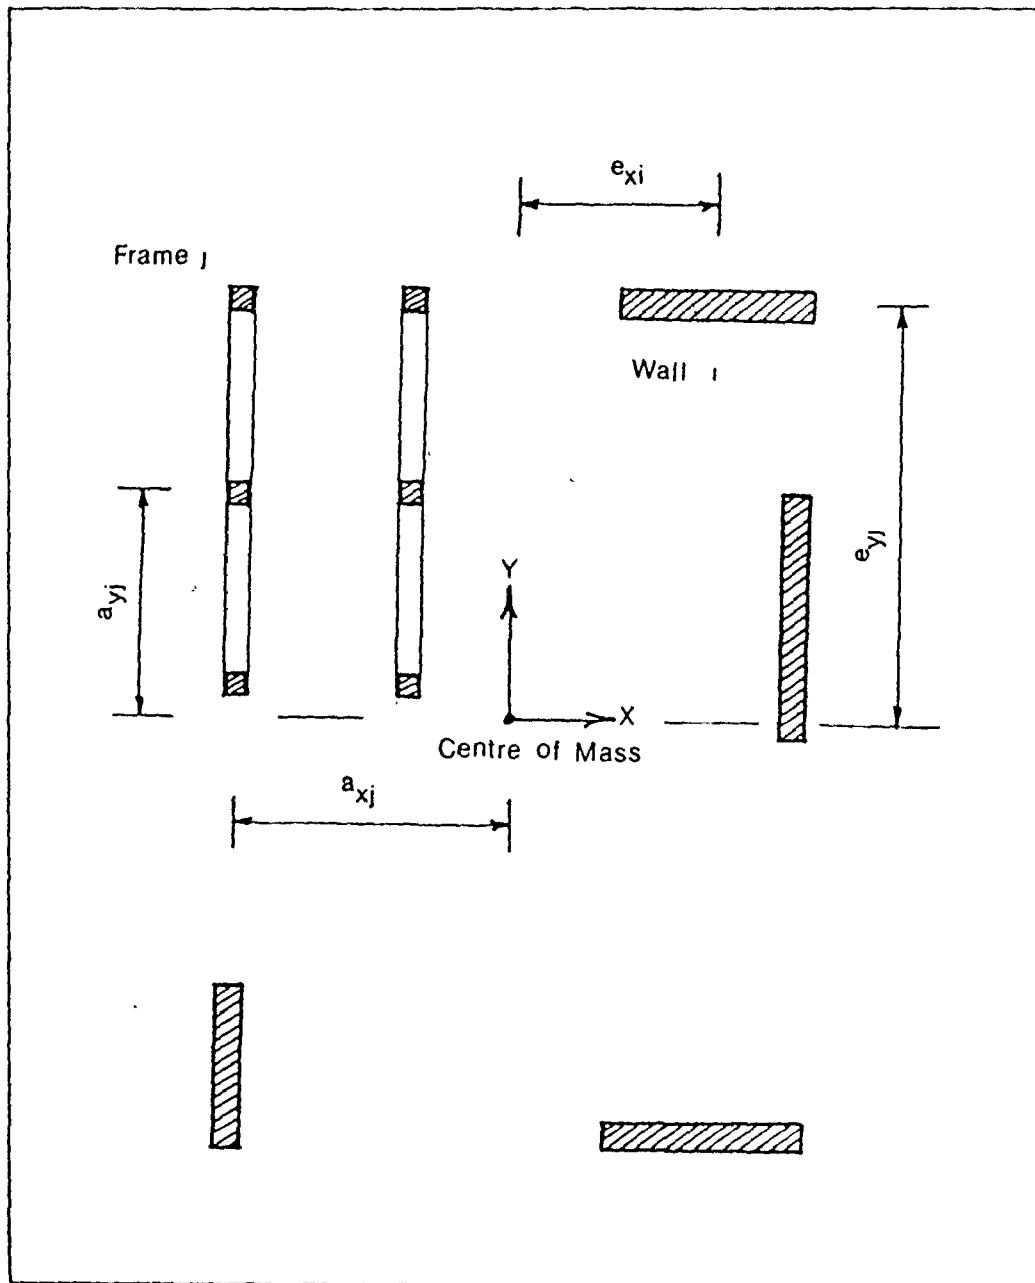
COORDINATE SYSTEM FOR A TYPICAL CROSS-SECTION OF ASYMMETRIC WALL-FRAME STRUCTURE
